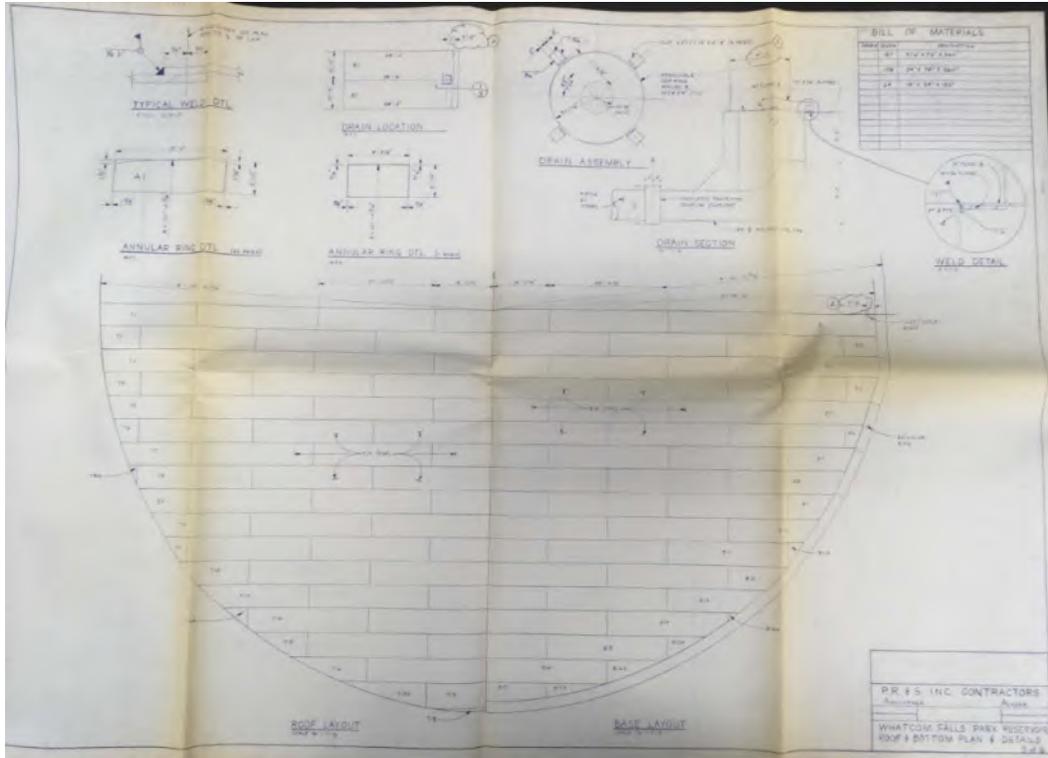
Whatcom Falls 1 – Roof and Bottom Plan and Details
